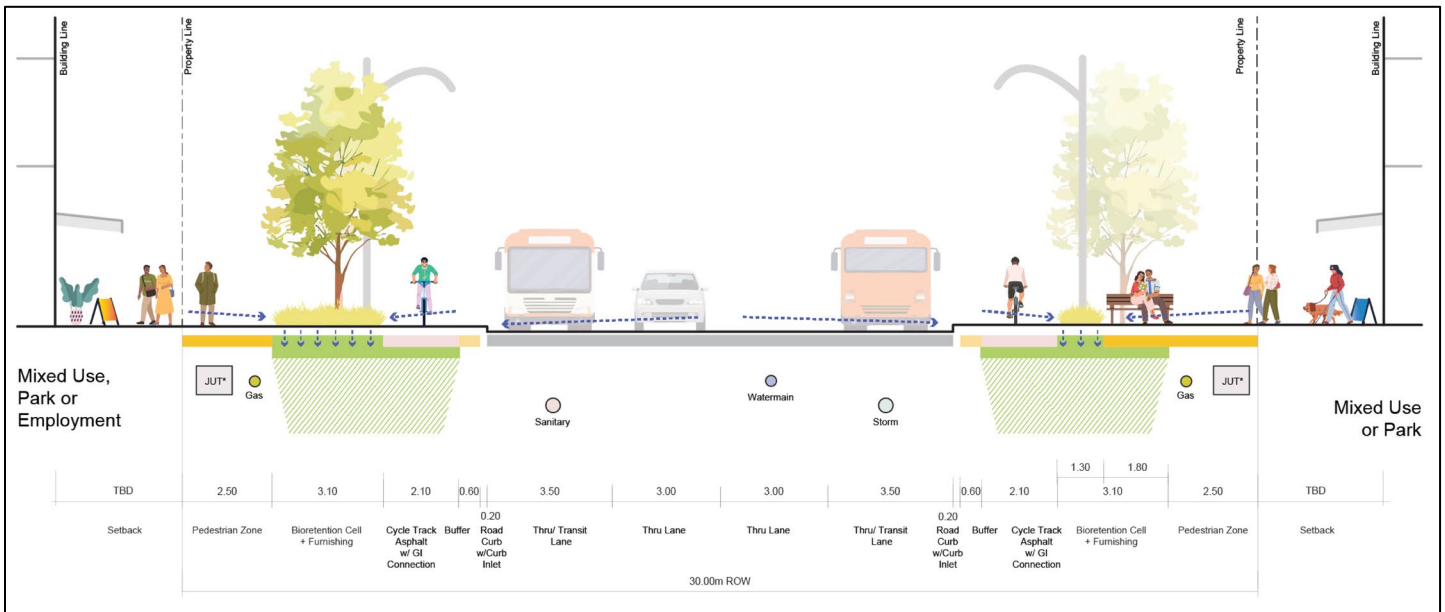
Dufferin Street (Beffort Road to Northern Street) Cross-Section - Option 3
